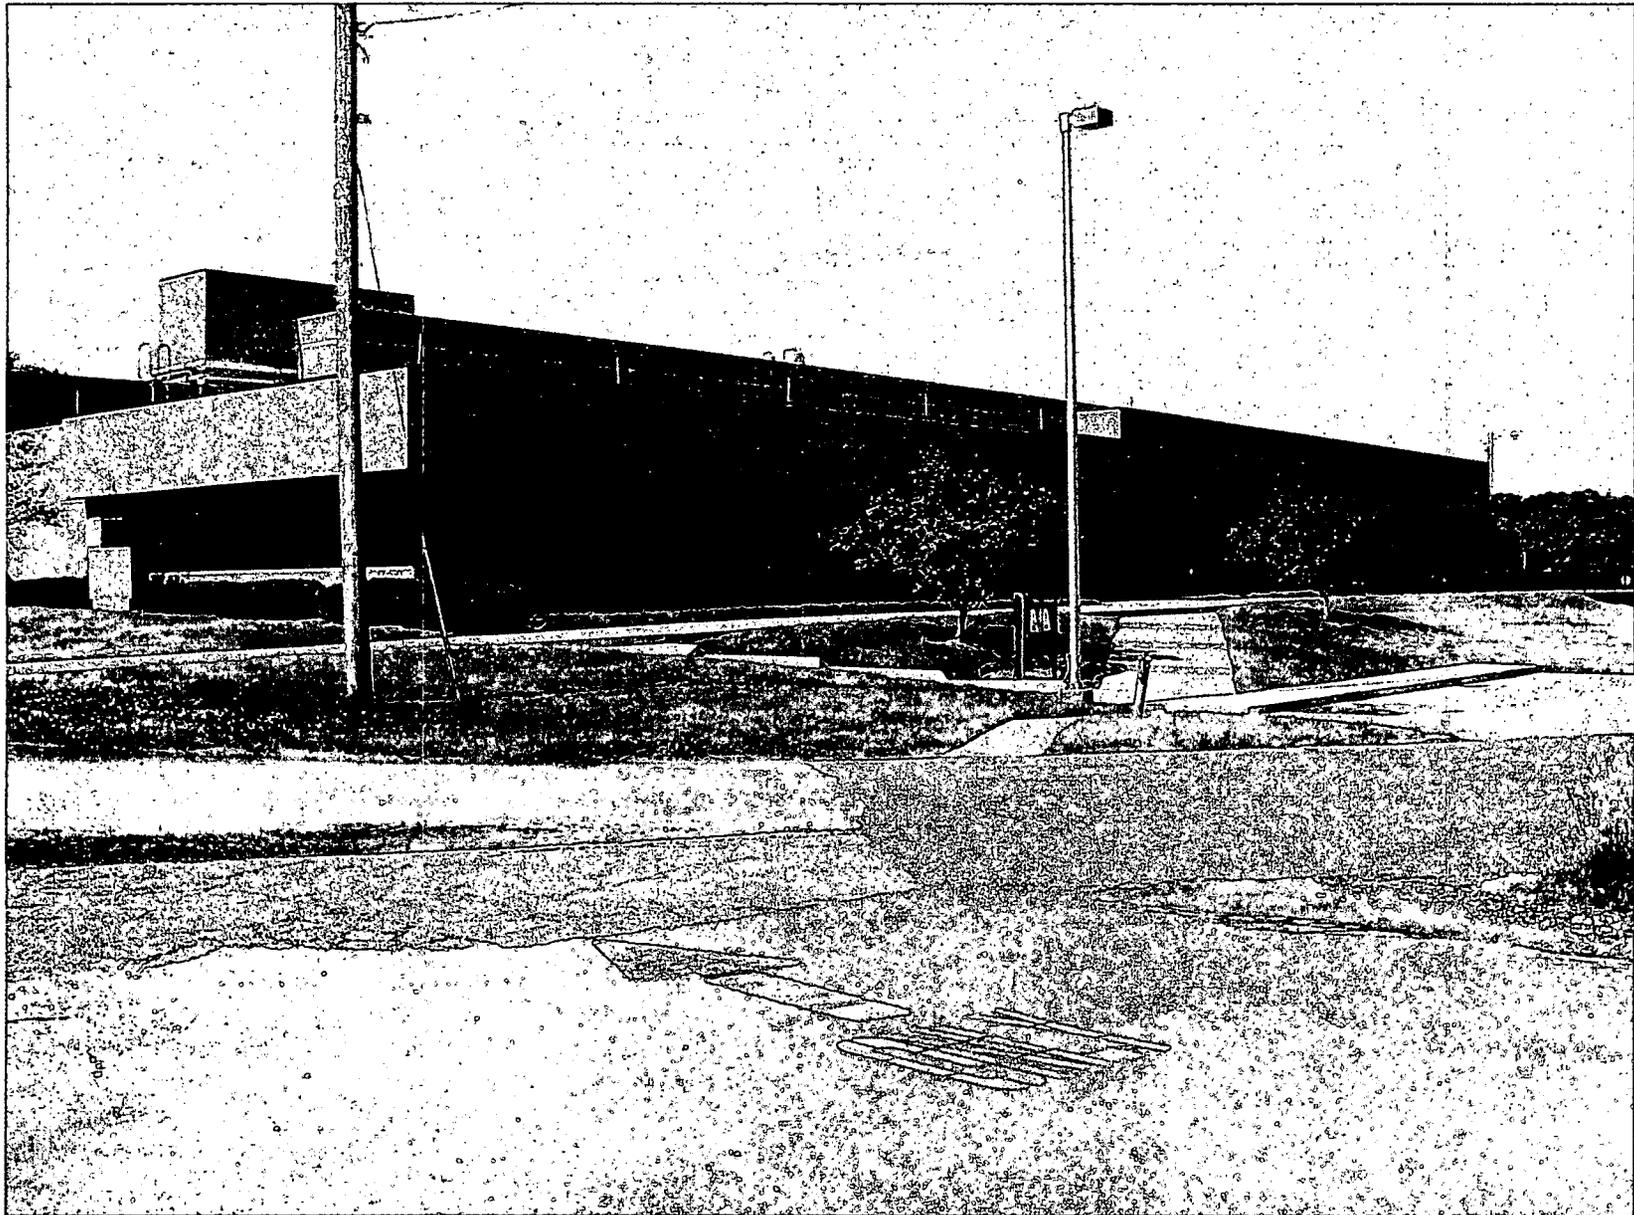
Building 87 located in the northern section of the Phase I.B Sub-Parcel. Building is currently occupied by a MMCIC tenant.
